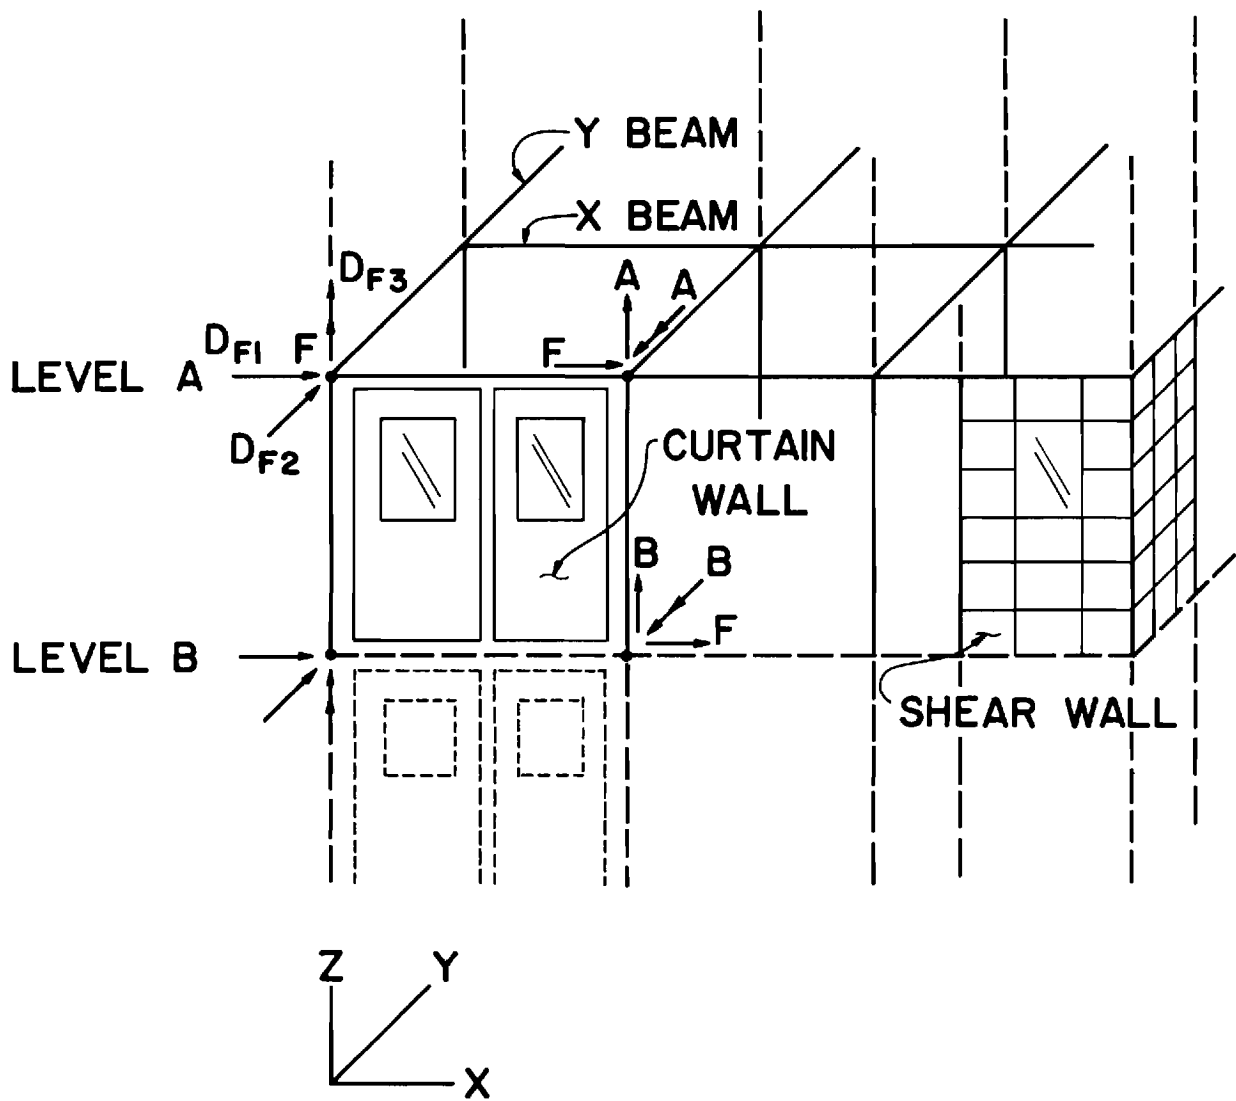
Tier Building Substructure with Curtain Wall Model
